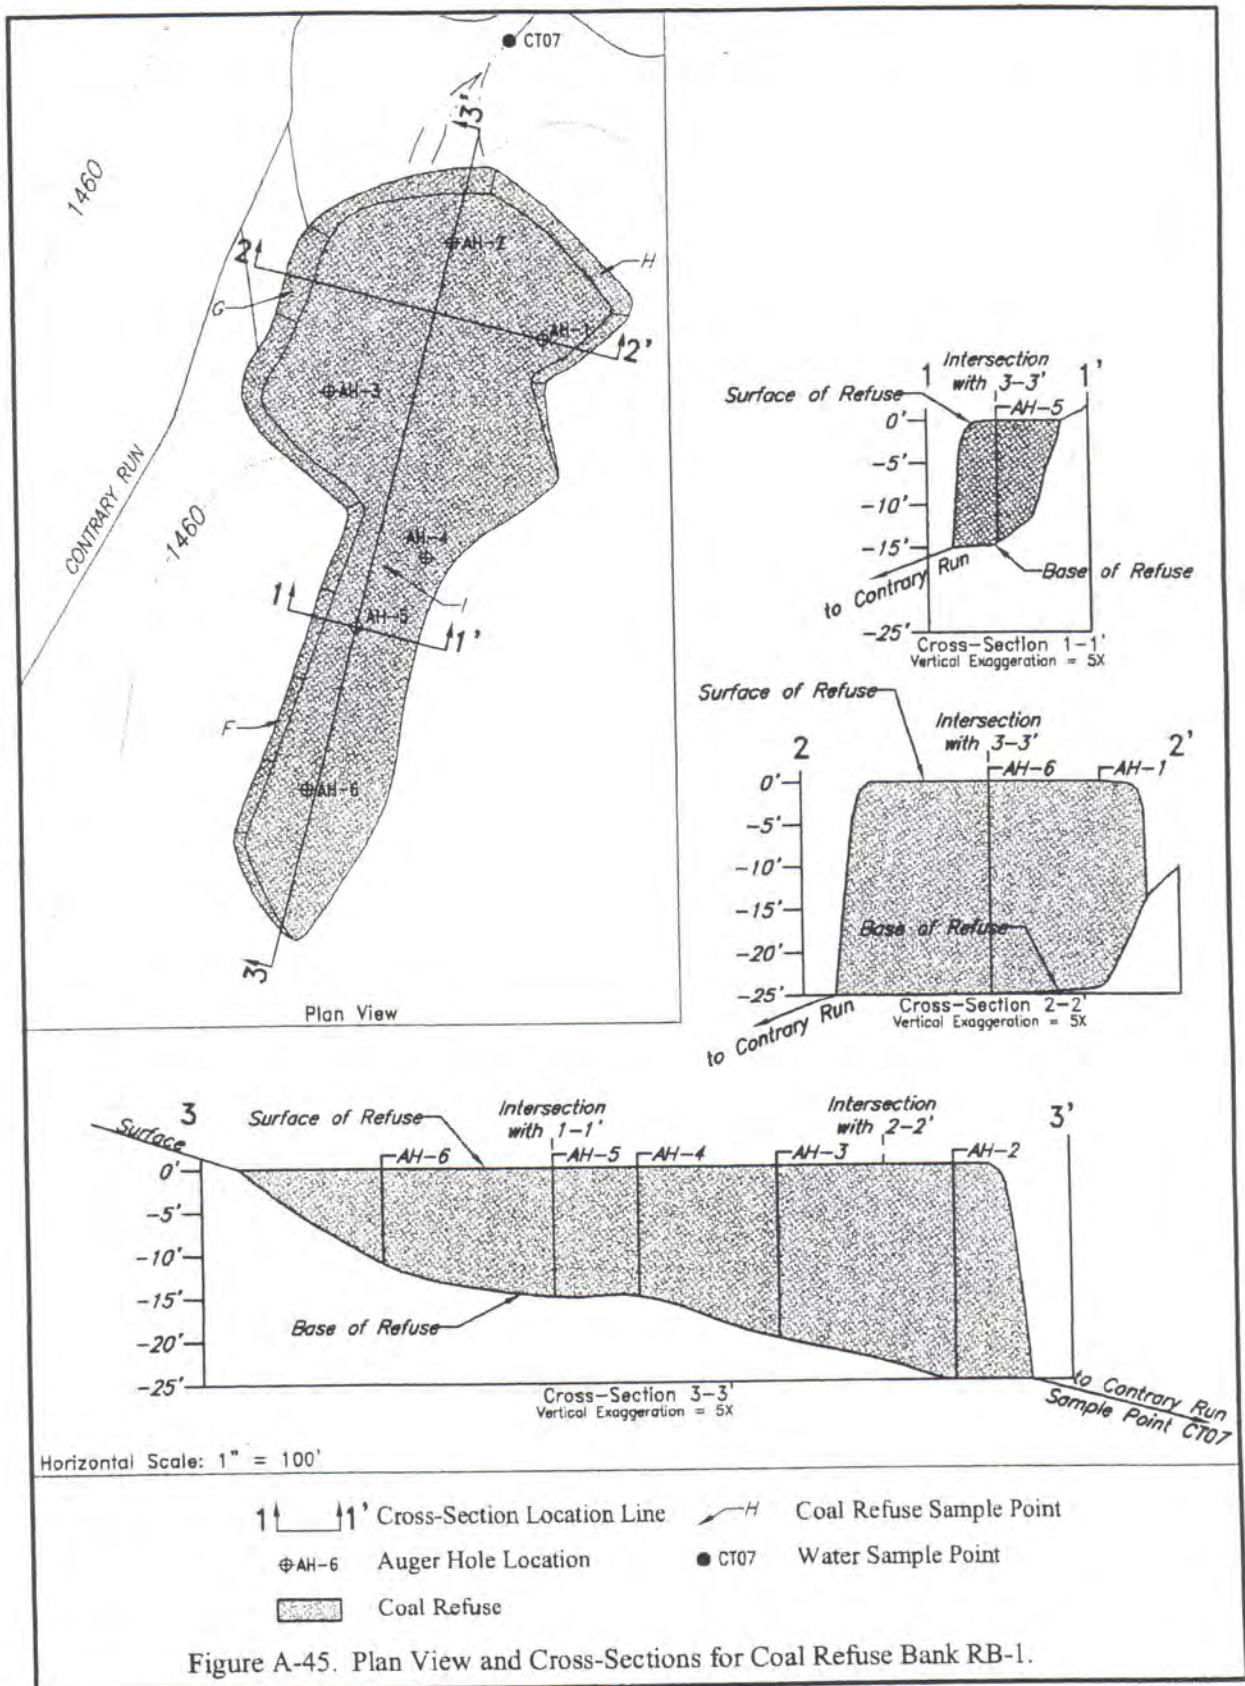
Plan View and Cross-Sections for Coal Refuse Bank RB-1.
